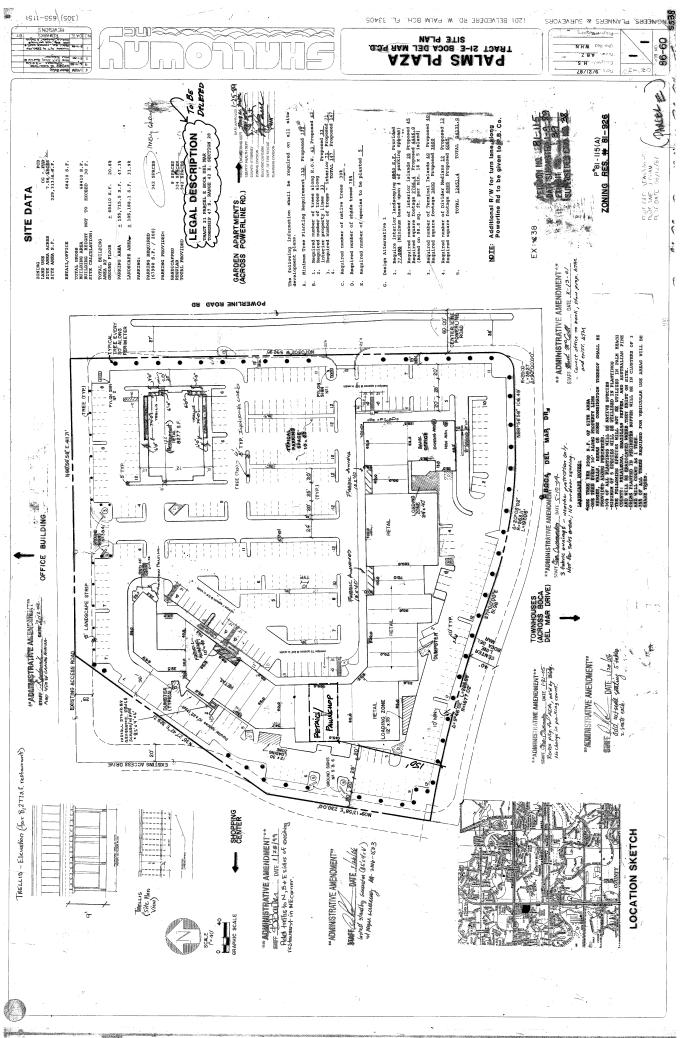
Preliminary Site Plan dated September 14, 2009 Proposed Pawnshop Use is indicated co-located with an existing 3,200 square foot retail jewelry store
